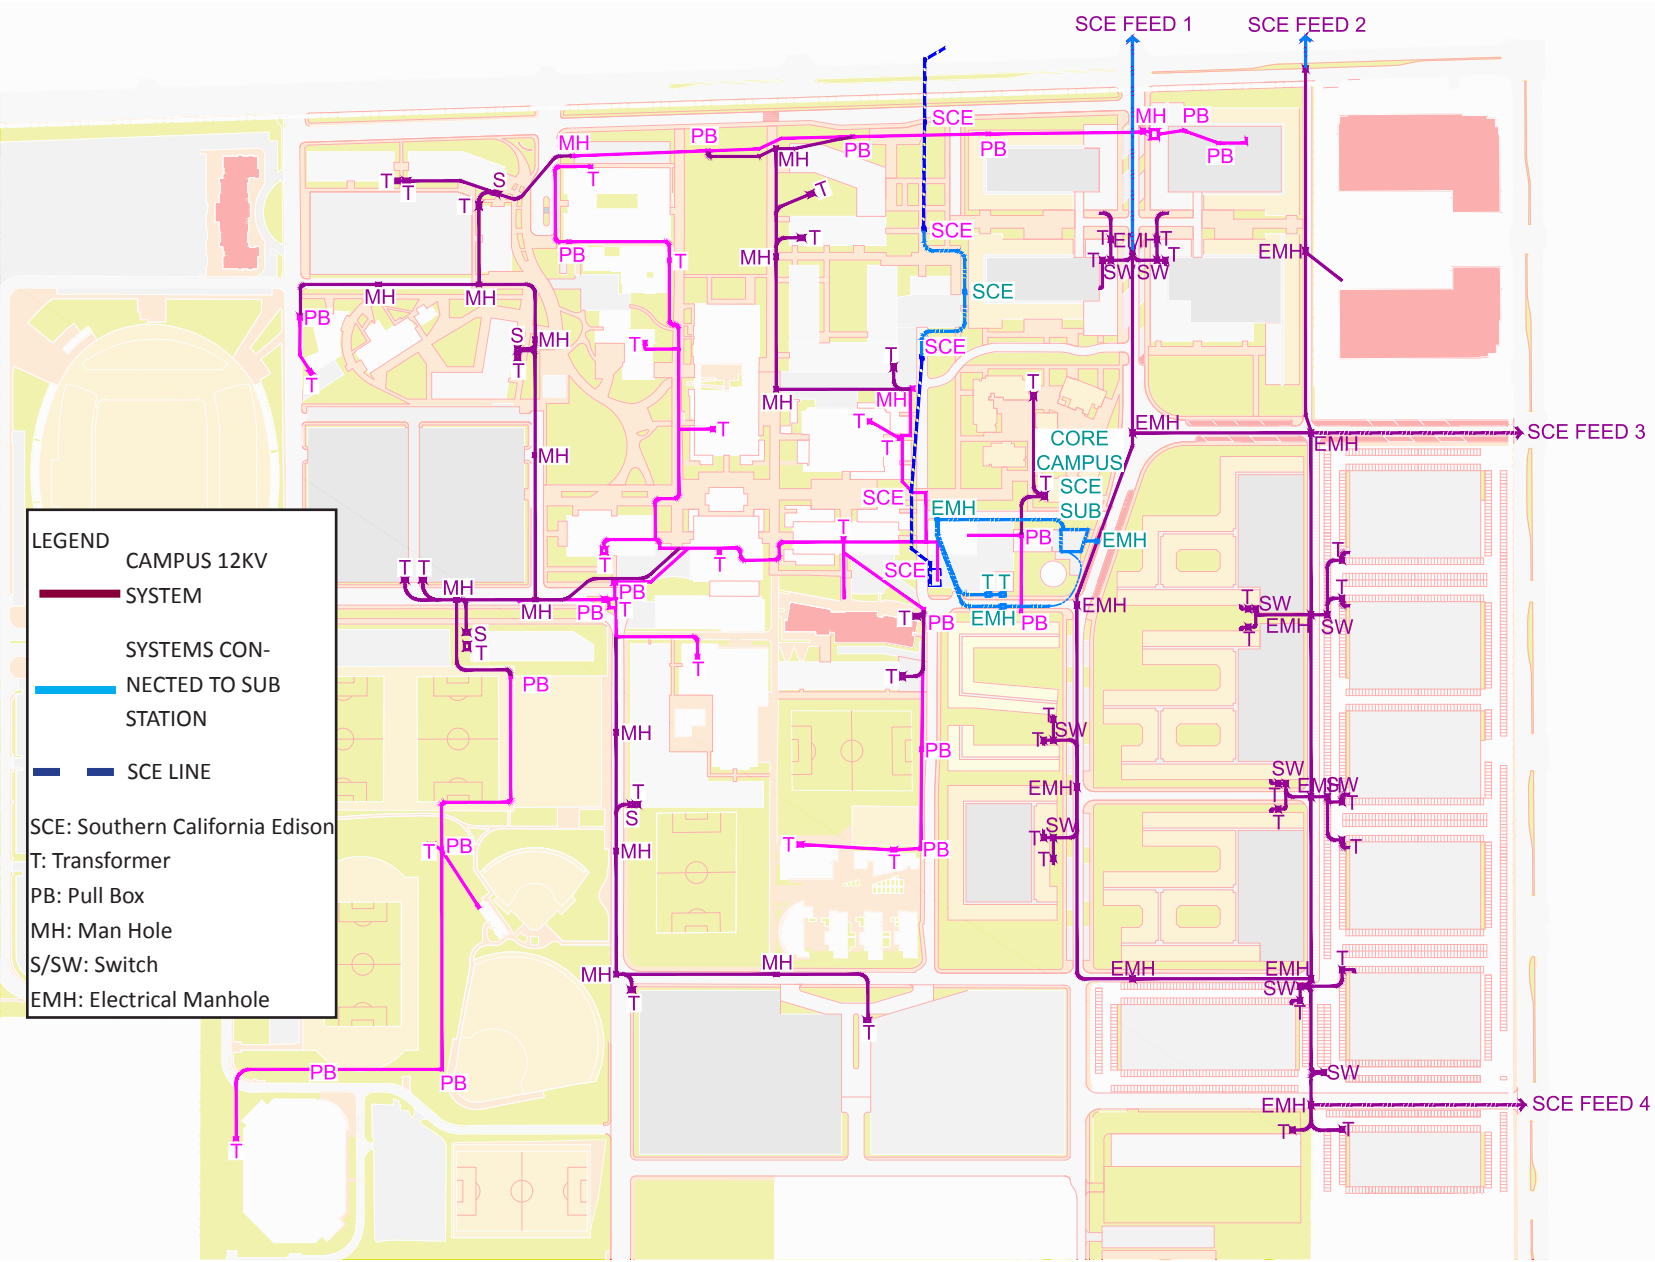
ELECTRIC POWER SITE DISTRIBUTION PLAN
